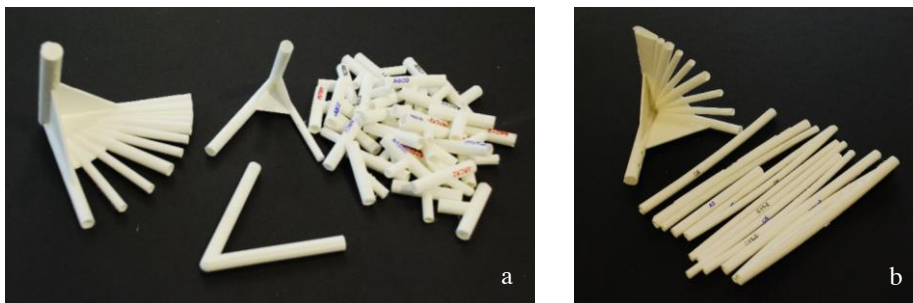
Labelled 3D printed connections produced from Konektor program and used in the assembly of the lightweight mobile structure.
